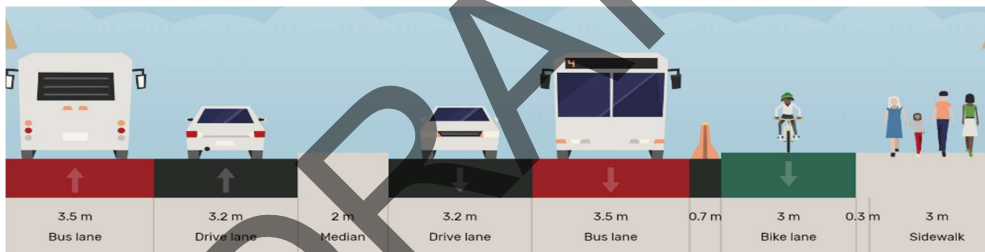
Option 4 – Hutt Road Indicative Plan and Cross Section
